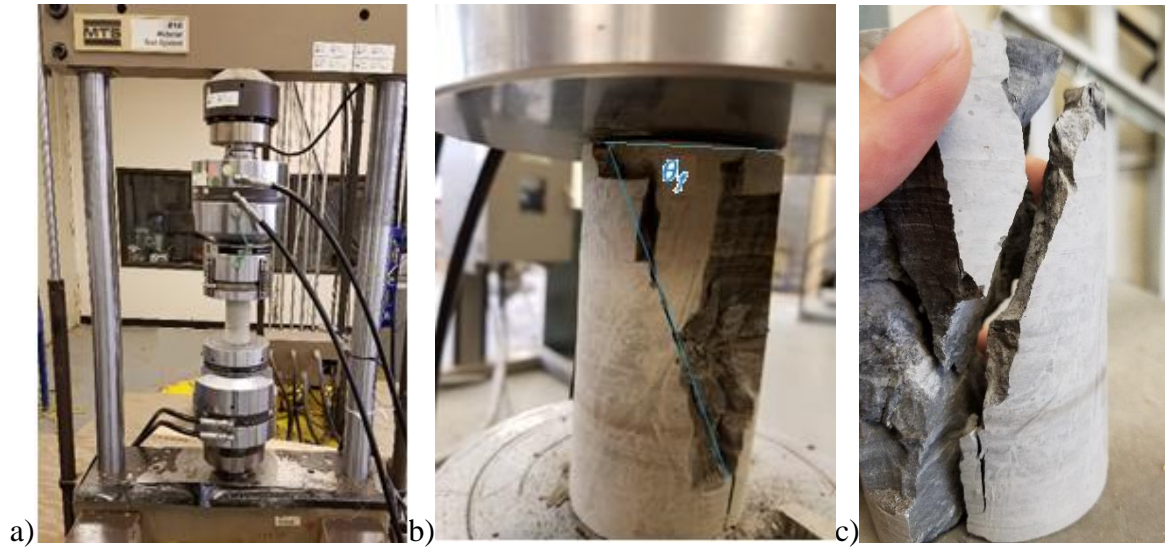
(a) test equipment (b & c) major crack on sample after the compression test
